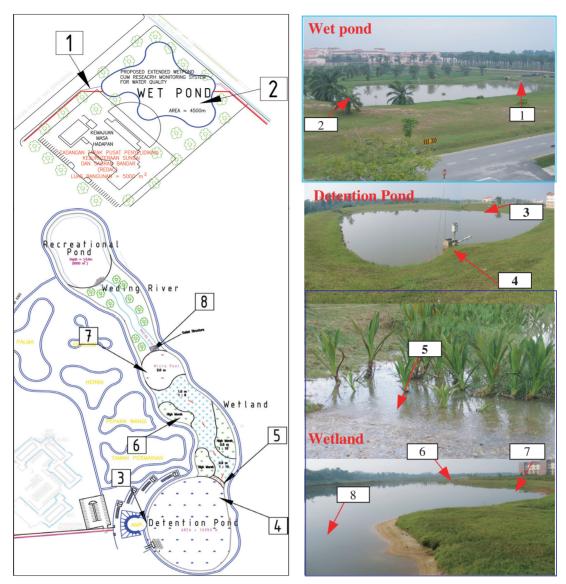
Sampling locations at Wet pond, Detention Pond and wetland.
